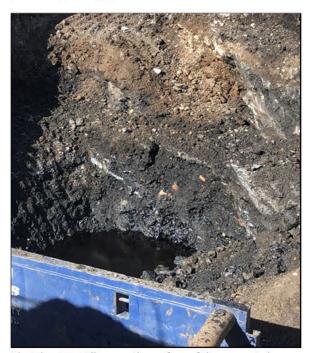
Oil from seeps on the sidewall impacting the groundwater. South side of the stormwater piping. 10/19/18. (START photo IMG_1570.jpg)
